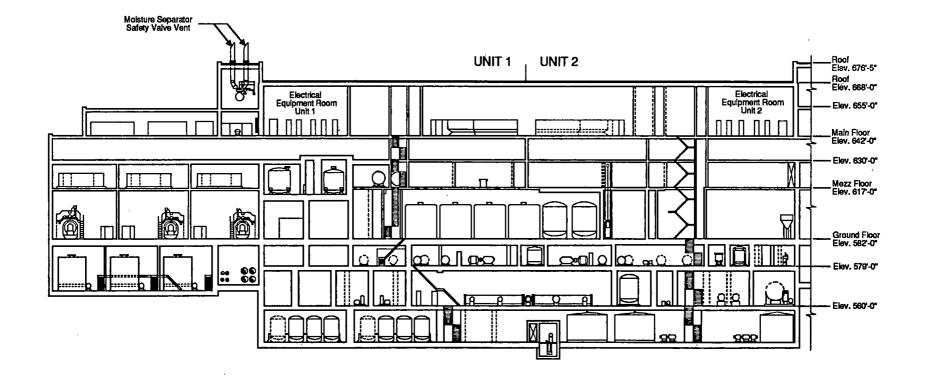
Zion 1 and 2 Section Drawings (Page 2 of 2)
